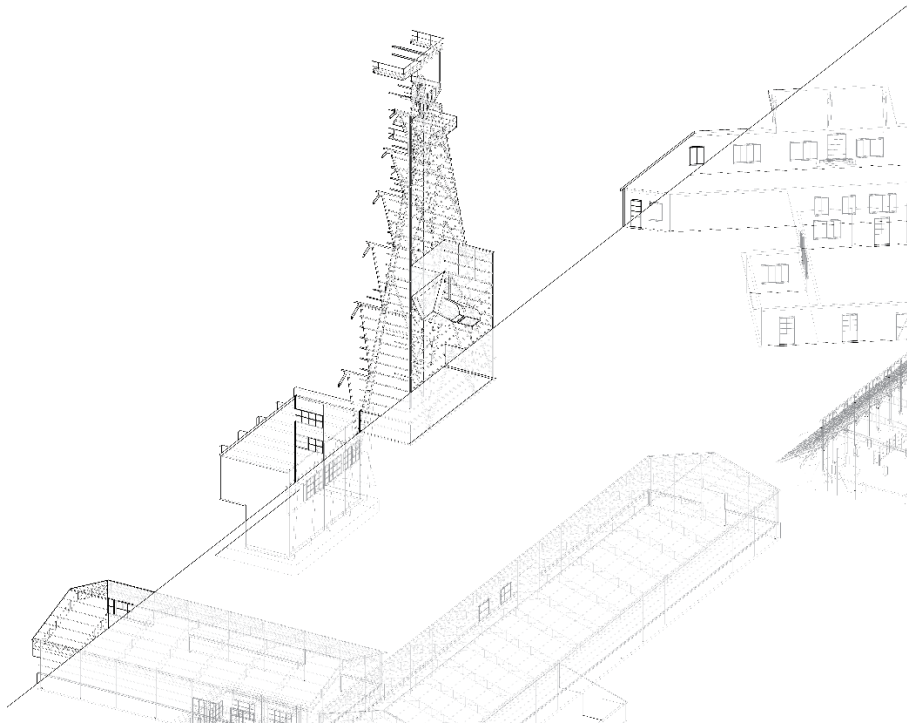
Site section worm's eye drawing by author, April 14, 2026.
